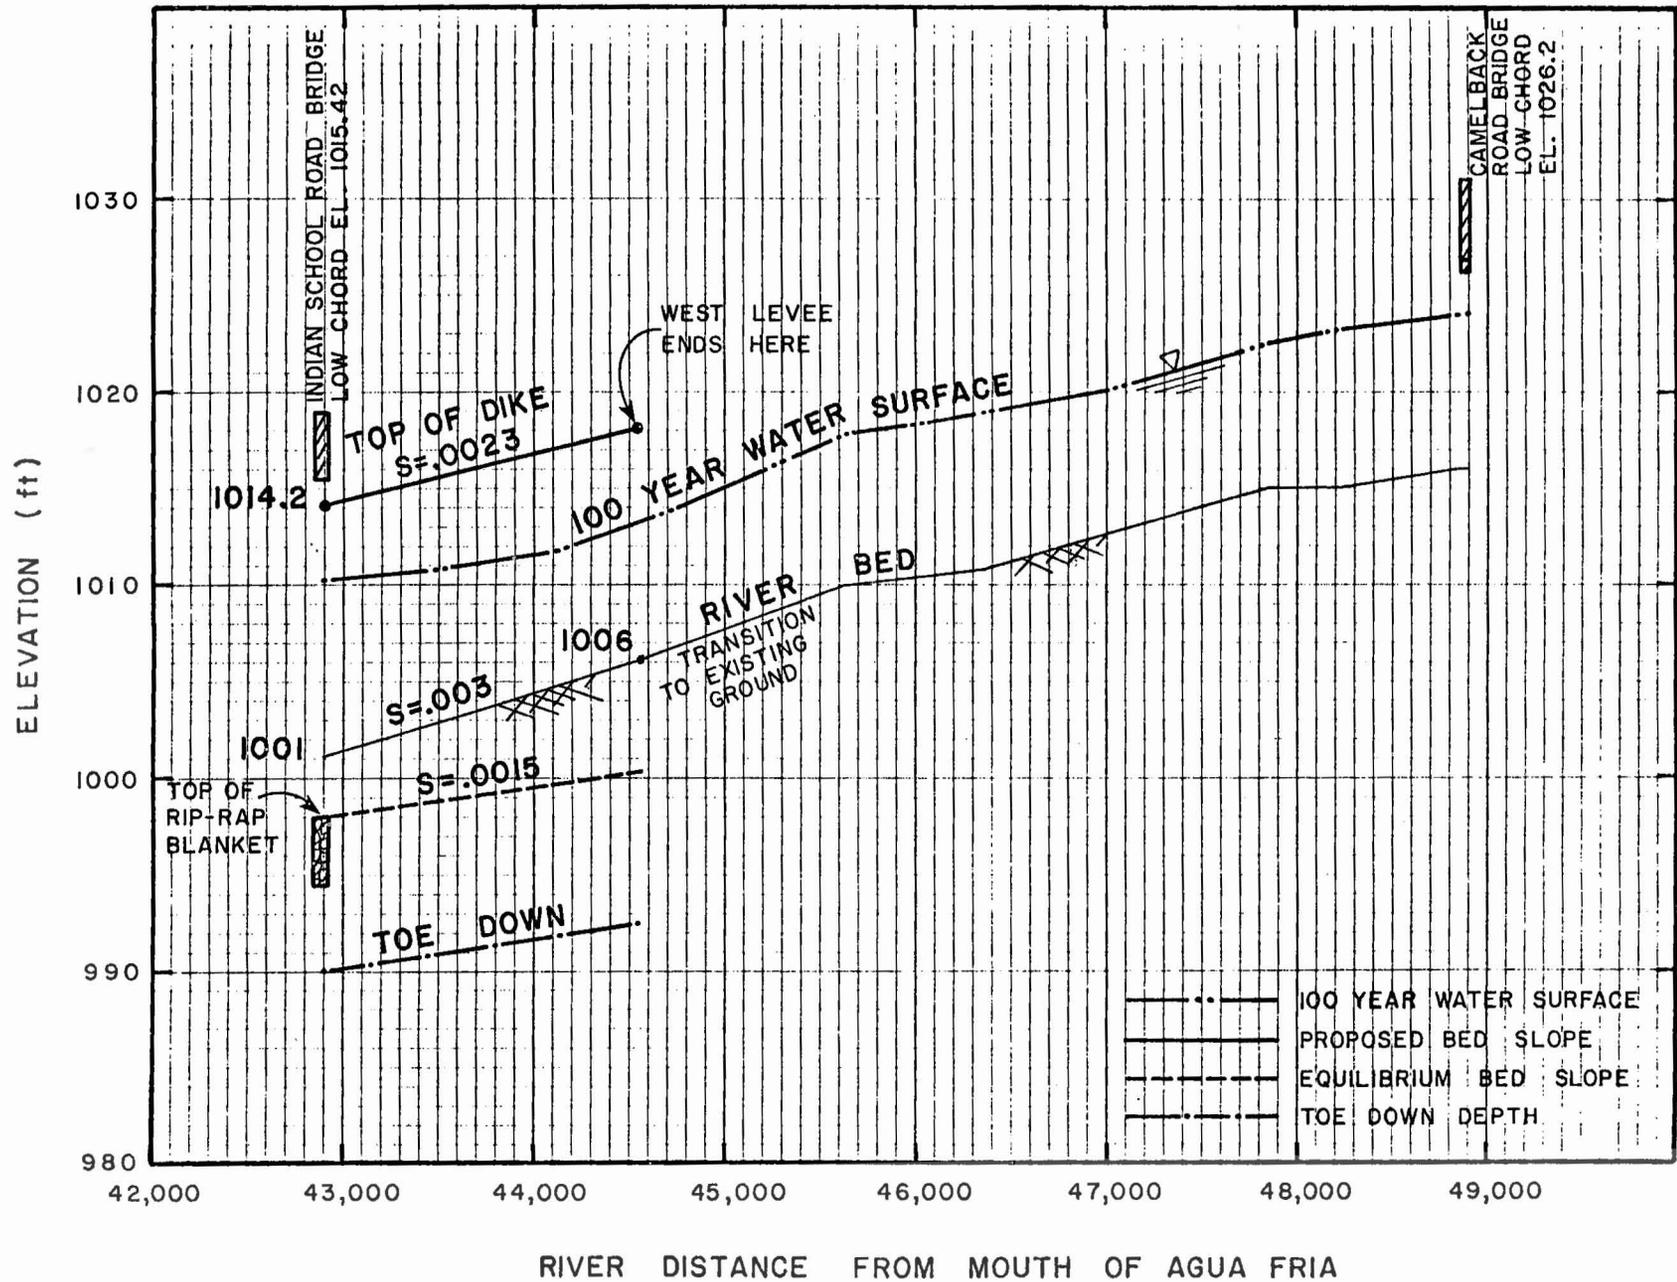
Proposed bed profile, equilibrium bed profile, 100-year water surface elevation, levee height and toe down depth between Camelback and Indian School Roads for Alternative 3.
